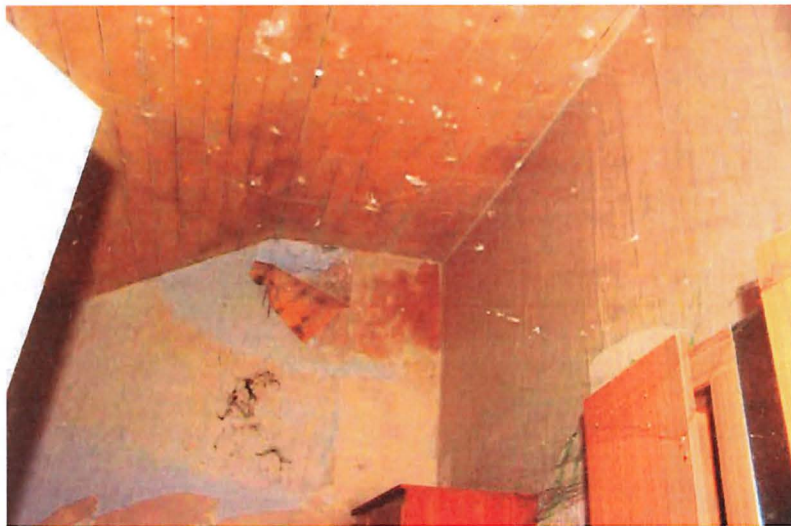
Room 1-02, looking south. The ceiling is sloped and has a timber board finish.
